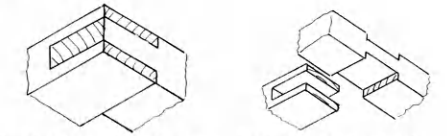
Open Mortise and Tenon Fig. 14 Bridle Joint
